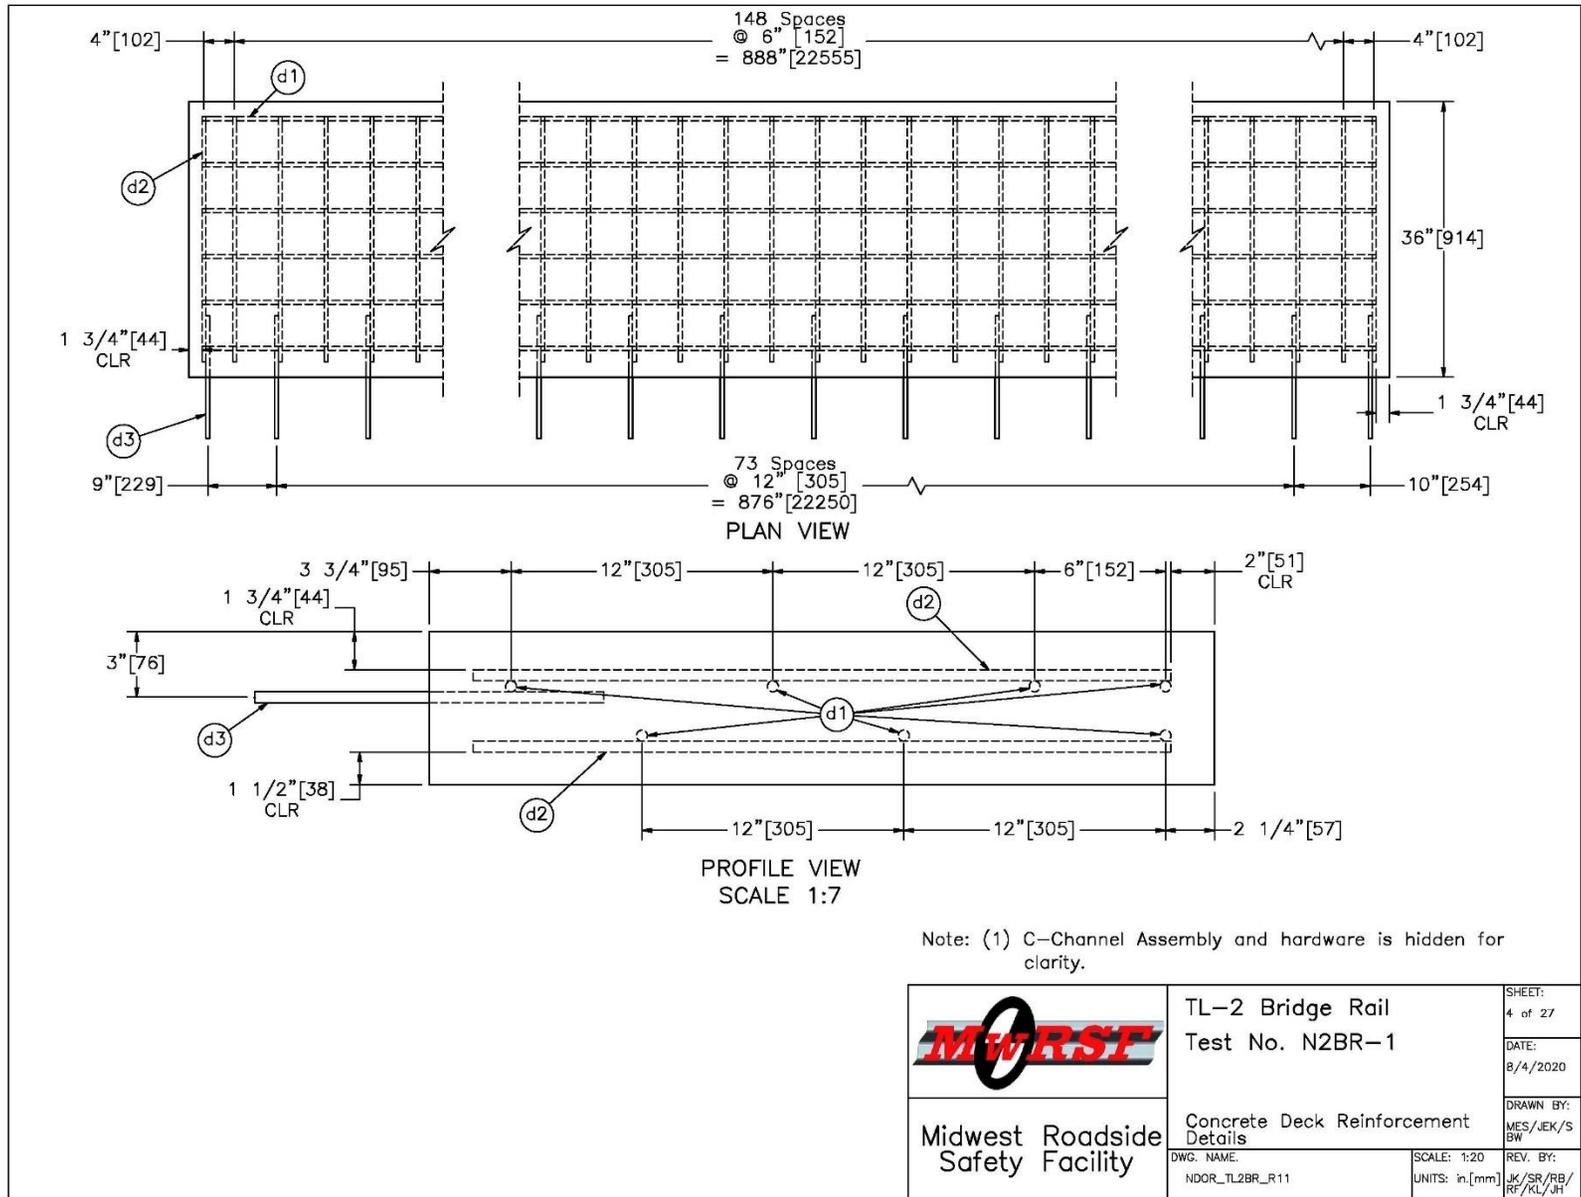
Concrete Deck Reinforcement, Test No. N2BR-1
